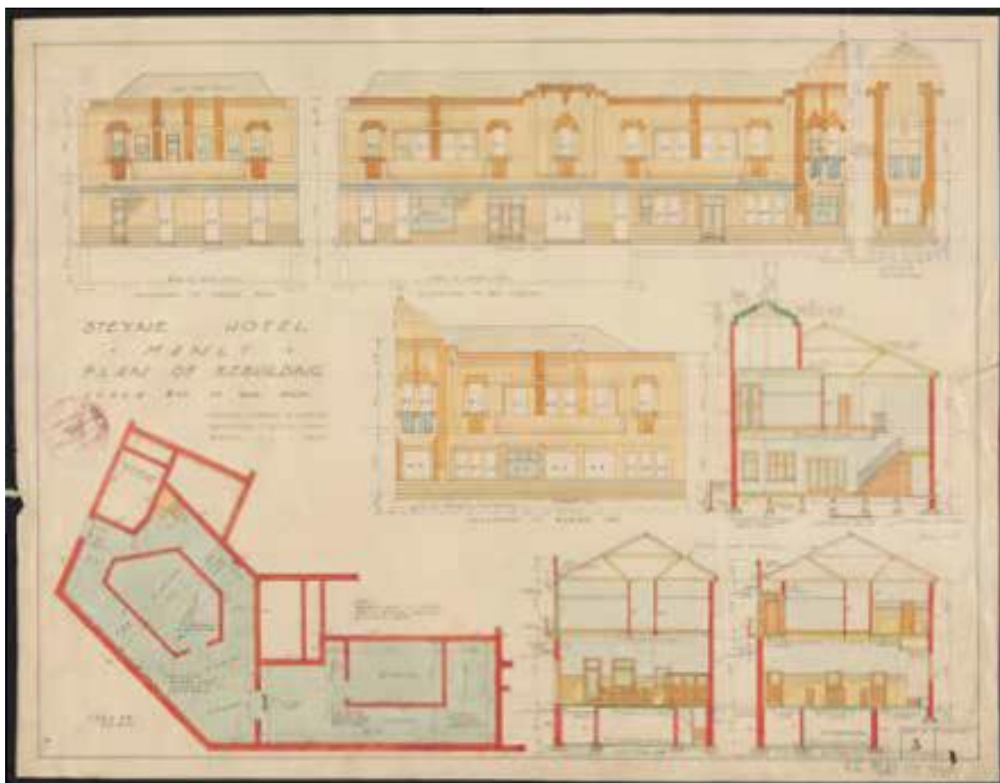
1935 Ground Floor Plan (part) and elevations of Hotel Steyne (Source: Architectural Projects Pty Ltd (October 2019), 'Conservation Management Plan - Hotel Steyne', extracted from State Records (Id: 71109)).
